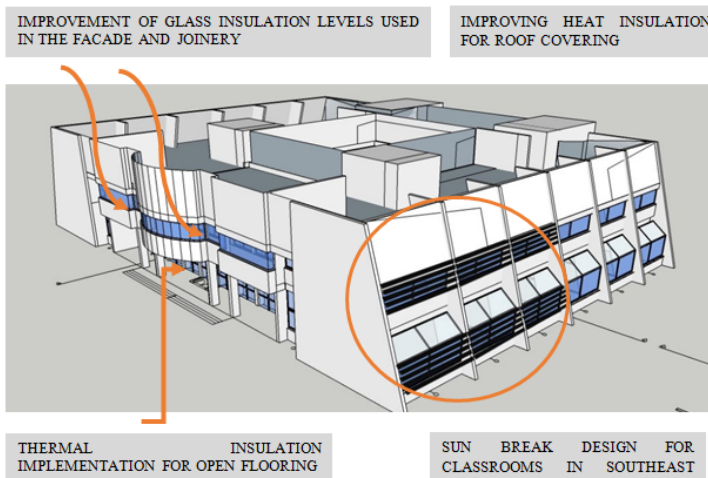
Areas to be reviewed on building envelope according to Suggestion 2
